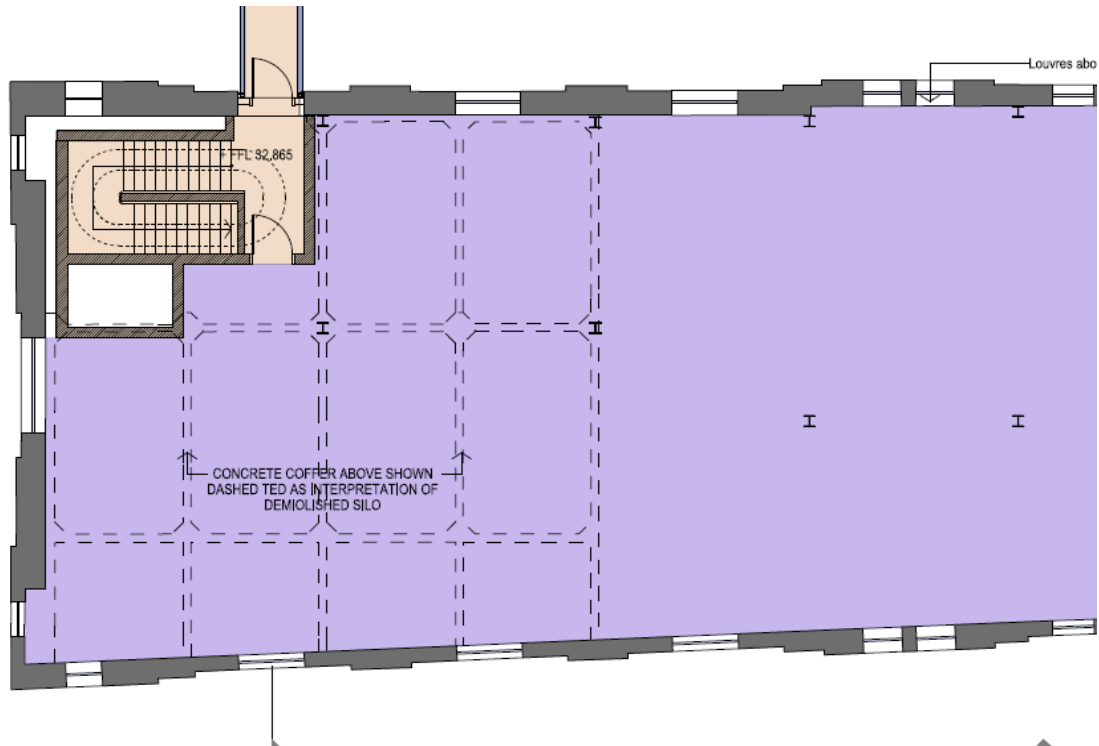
Part plan of proposed level 4 illustrating the reinterpretation of 5 of the 8 former hoppers in the ceiling (proposed on levels 3 and 4)
